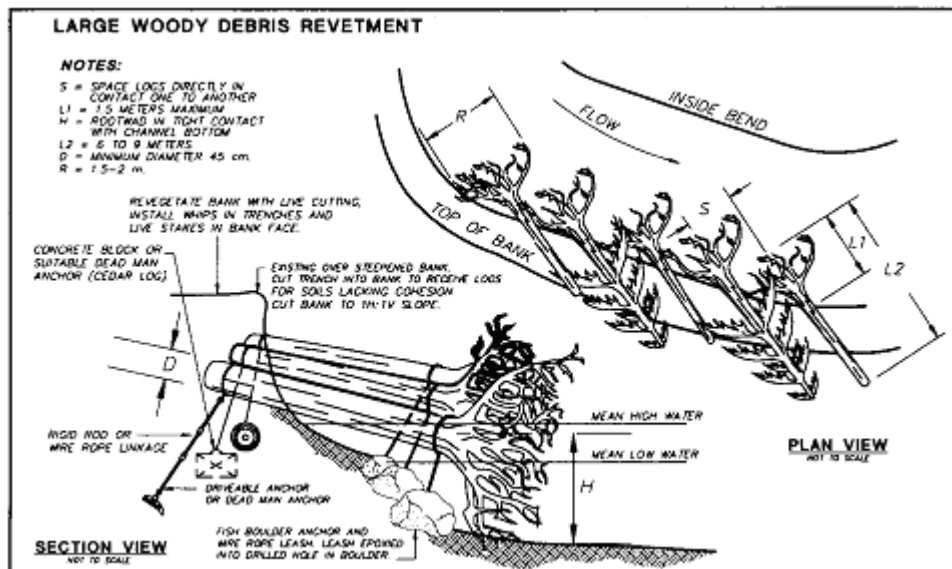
Typical large woody debris revement installation (Slaney & Zaldokas, 1997).
